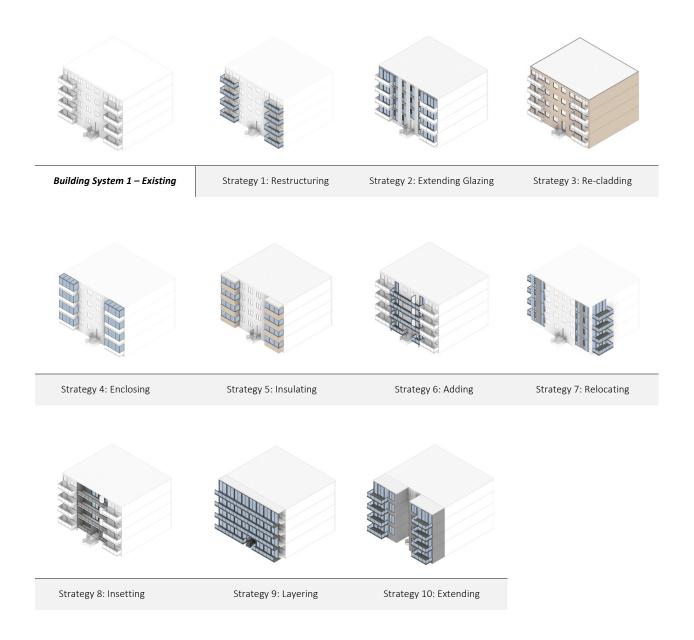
Building System #1, Existing Condition and 10 Building Adaptation Strategies
